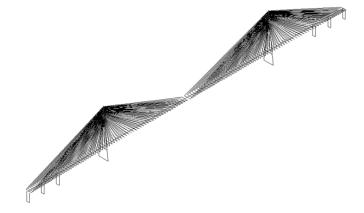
Finite element model of the Sutong cable-stayed bridge.
